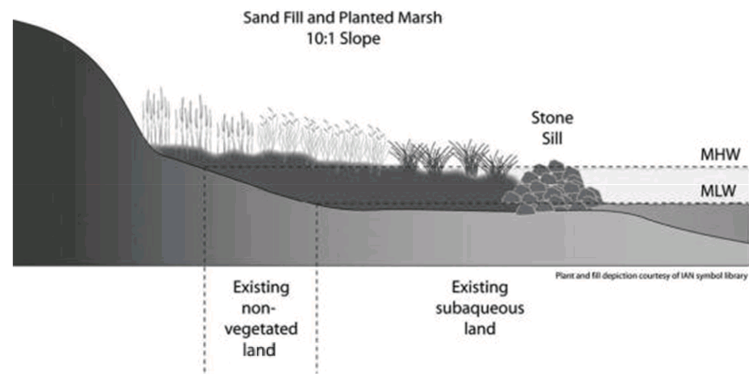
Typical cross section of a marsh sill with sand fill and tidal planted marsh vegetation.
